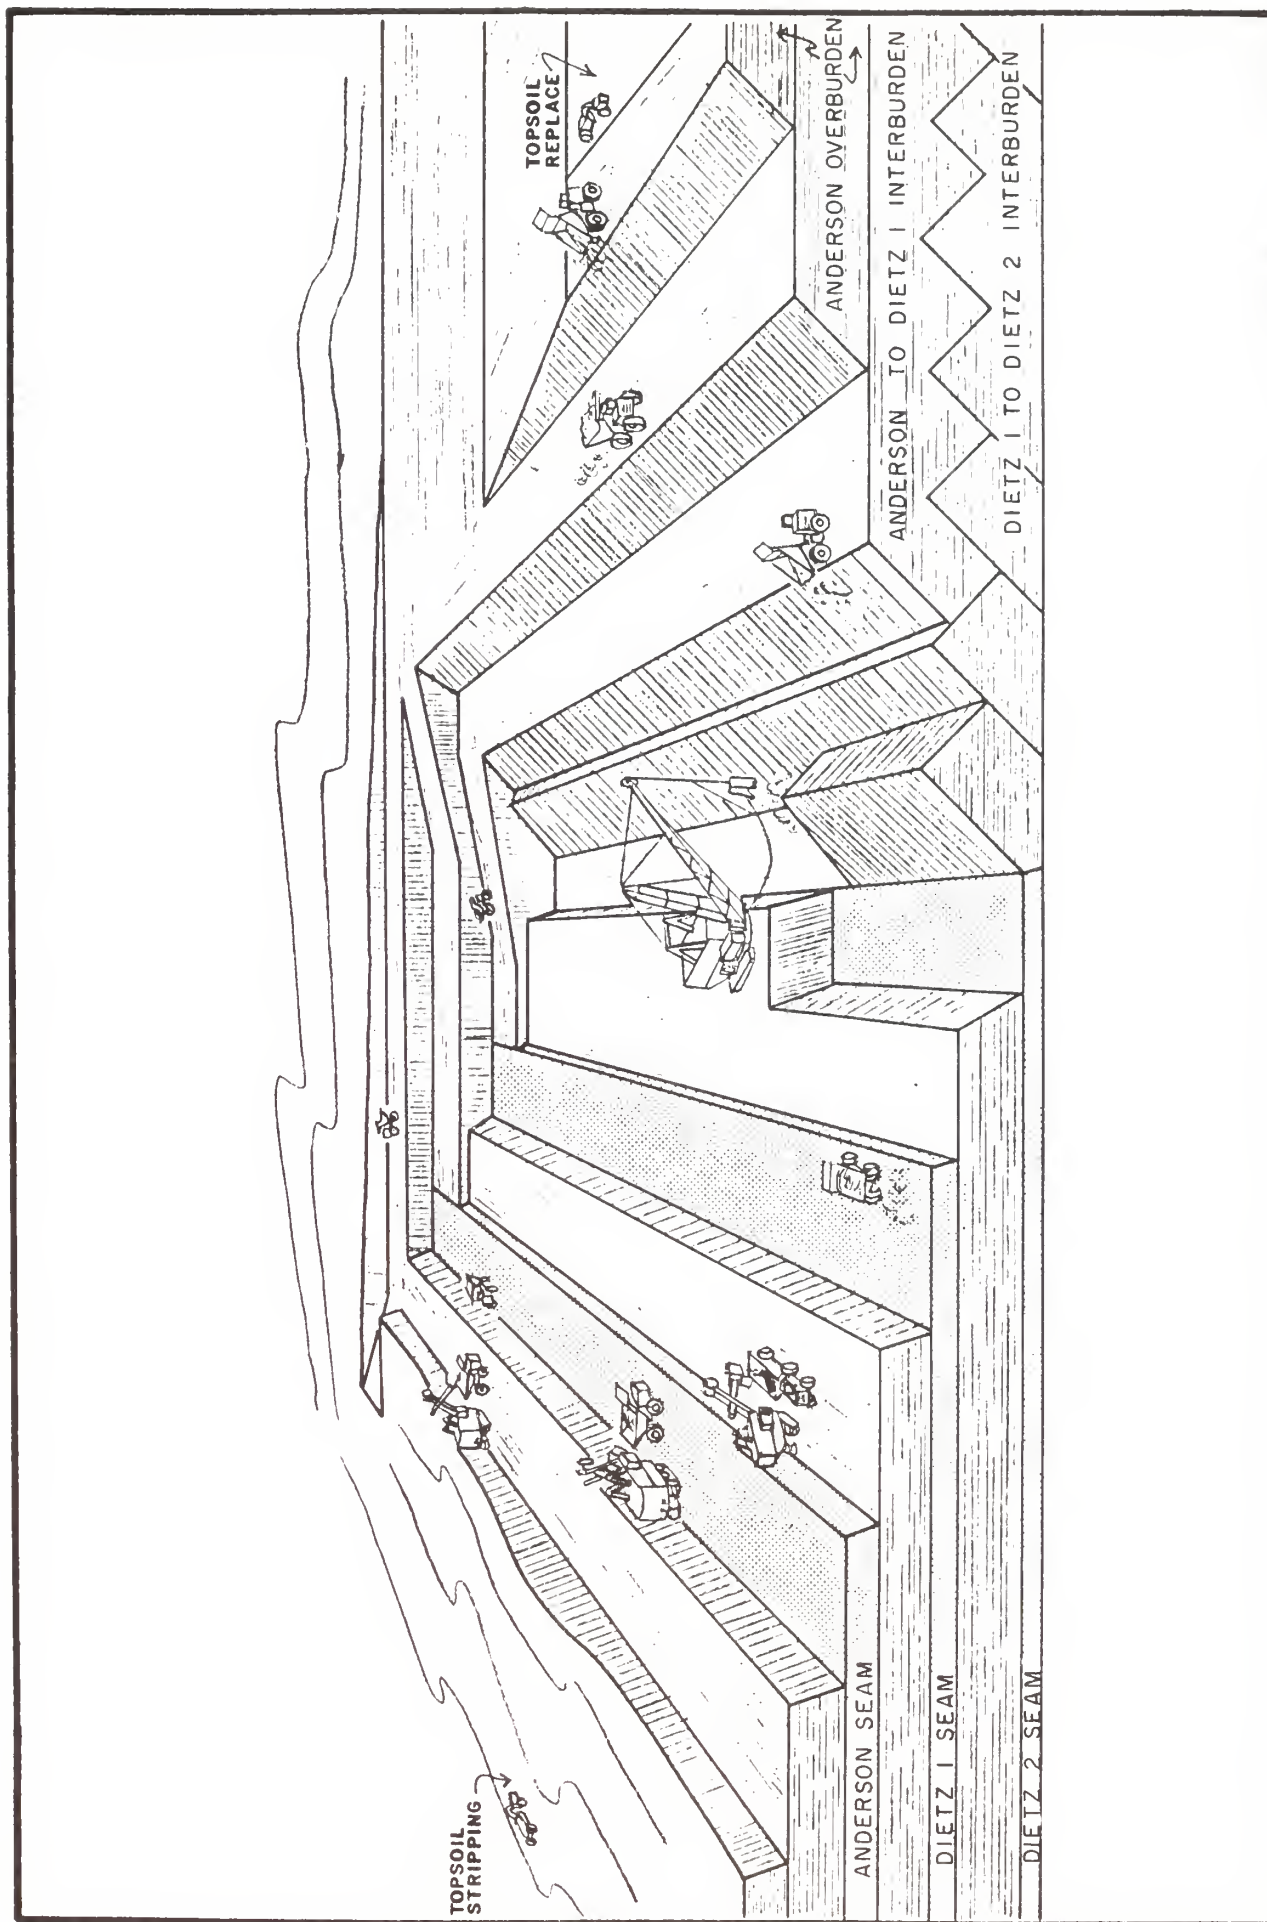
Schematic block diagram showing method of overburden and coal removal and placement of spoils under Alternate Mining Plan B-3 in the East Decker area.
